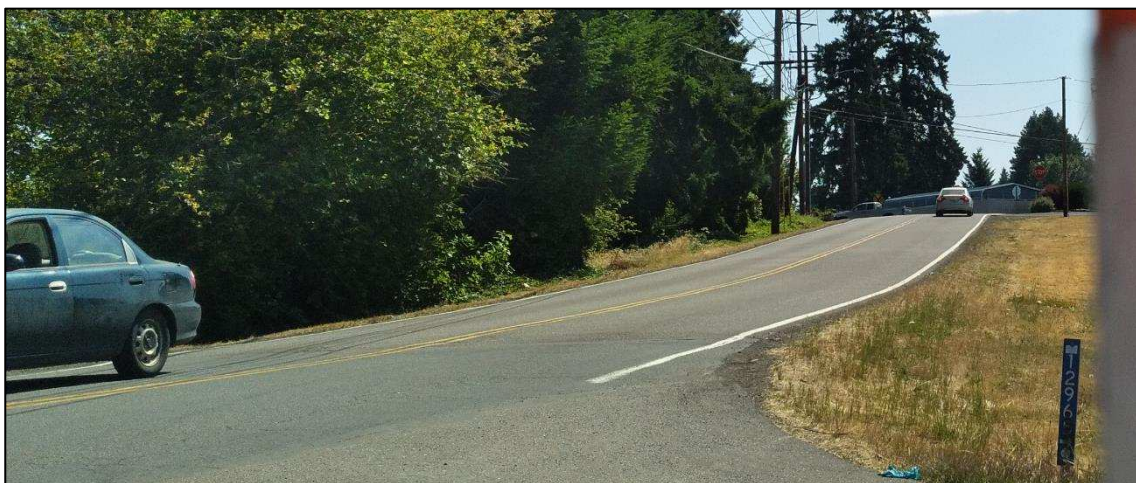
Shared Driveway Looking to the Southwest along SW Herman Road
